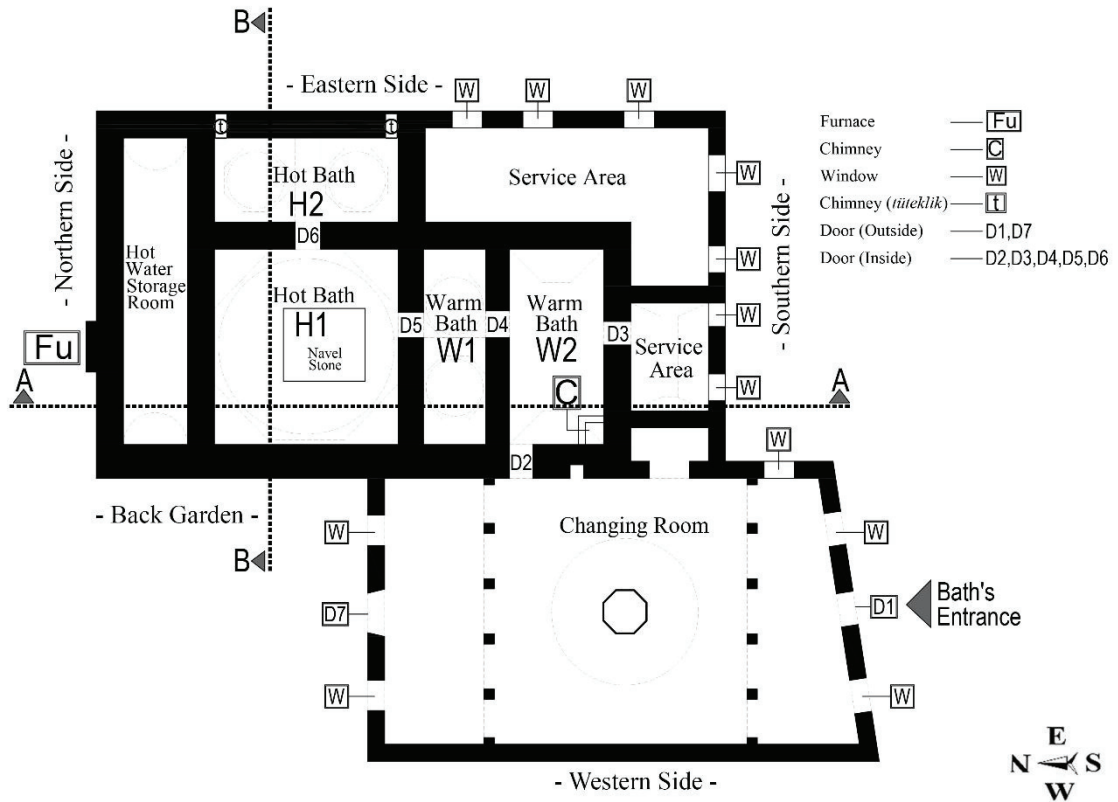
Plan of the Alibey Bath. (Scale: 1/200)
